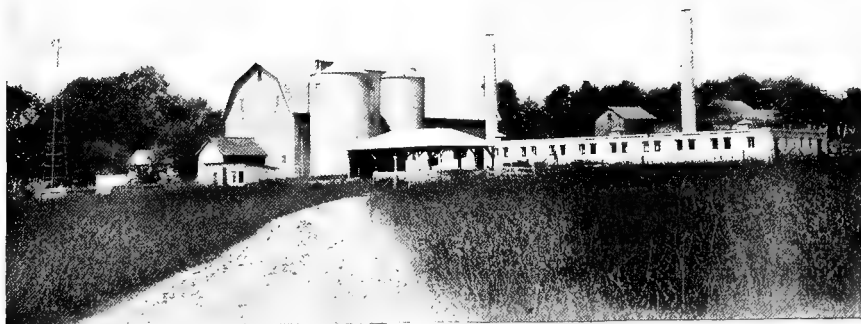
Beach Farm Dairy, Coldwater, Michigan, Neal & Angevine, proprietors. Barns, silos, dairy house and other buildings are of monolithic concrete. The walls of all the structures except the silos are marked off in imitation of concrete blocks. The low building to the right is the dairy barn, which is ventilated by means of the two concrete stacks. R. C. Angevine, Coldwater, was the contractor.
